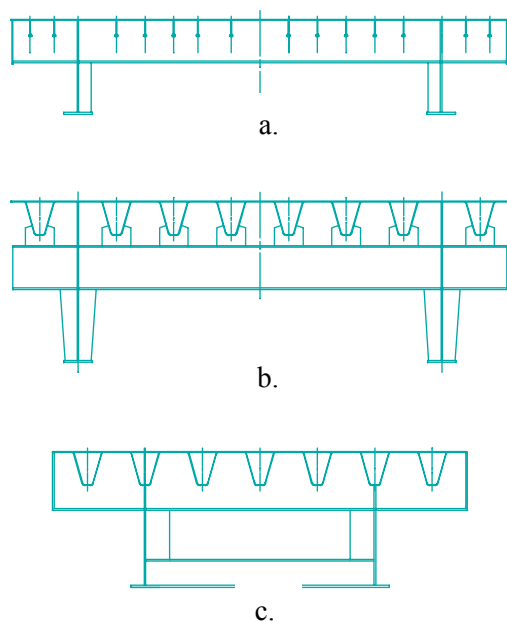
Cross sections of steel bridges with orthotropic decks (not to scale)
